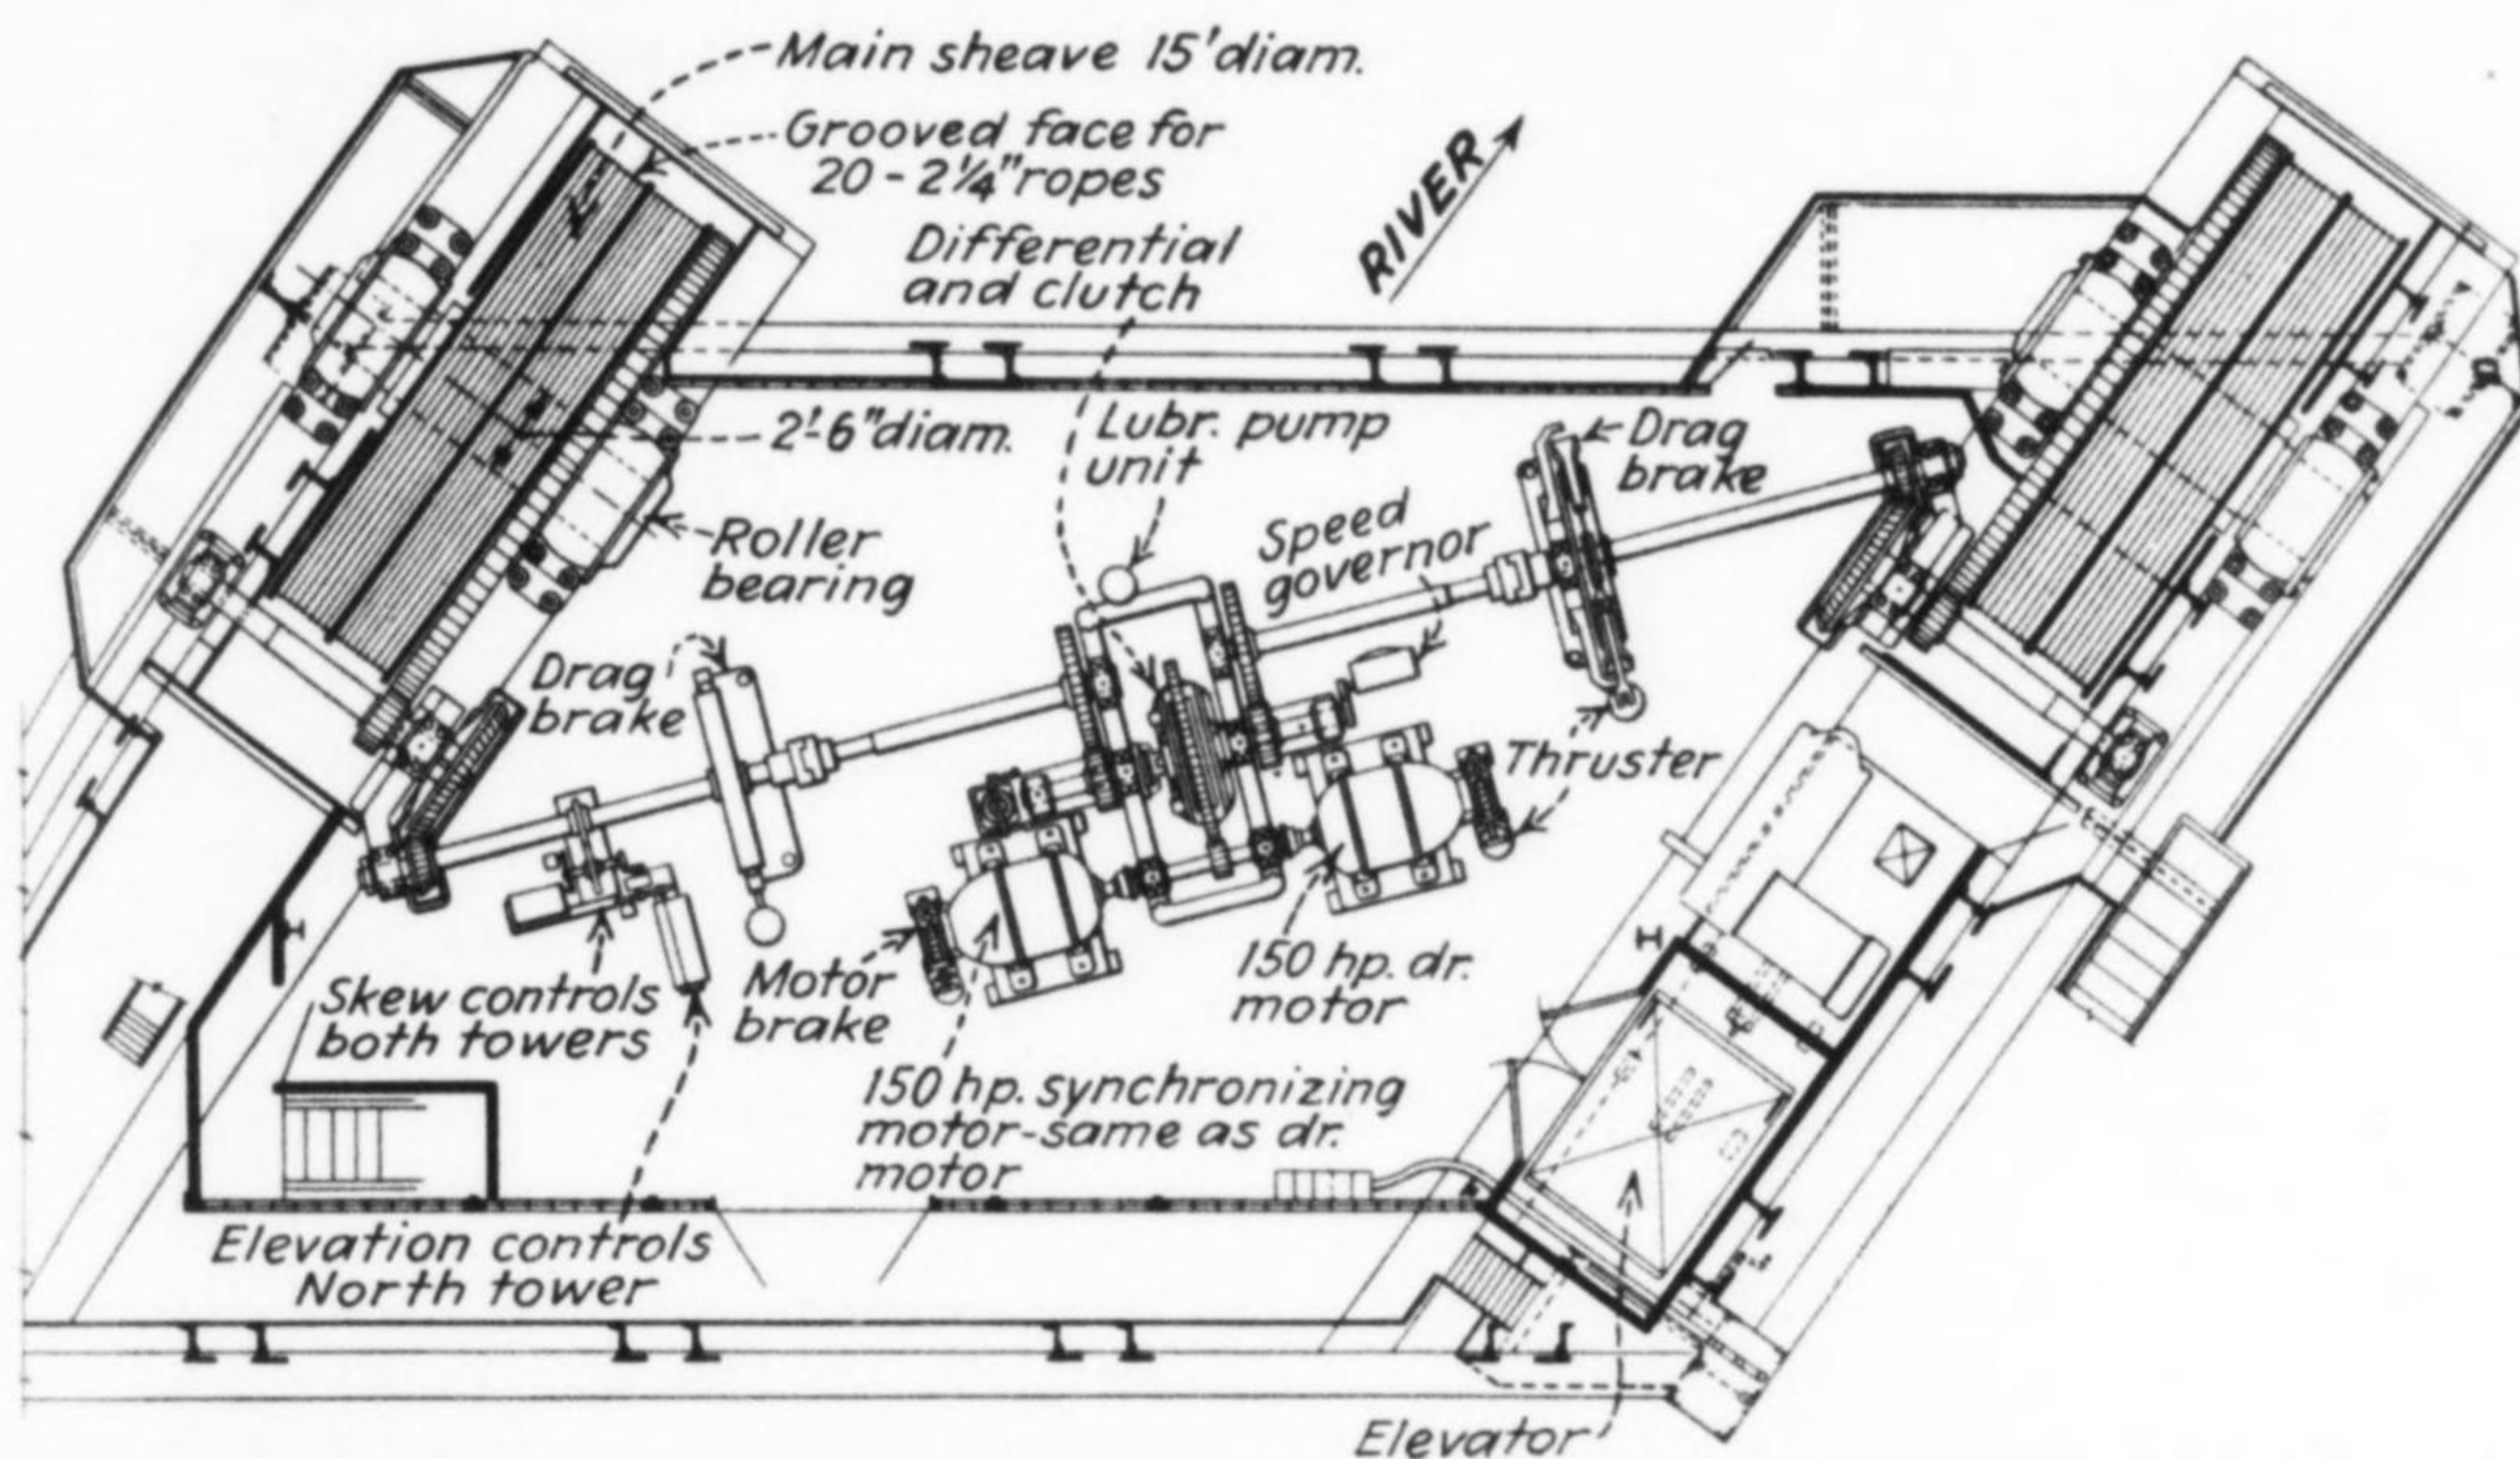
In machinery rooms at the tower tops are located the drive and synchro-tie motors operating the counterweight sheaves through bevel gears on cross shafts
